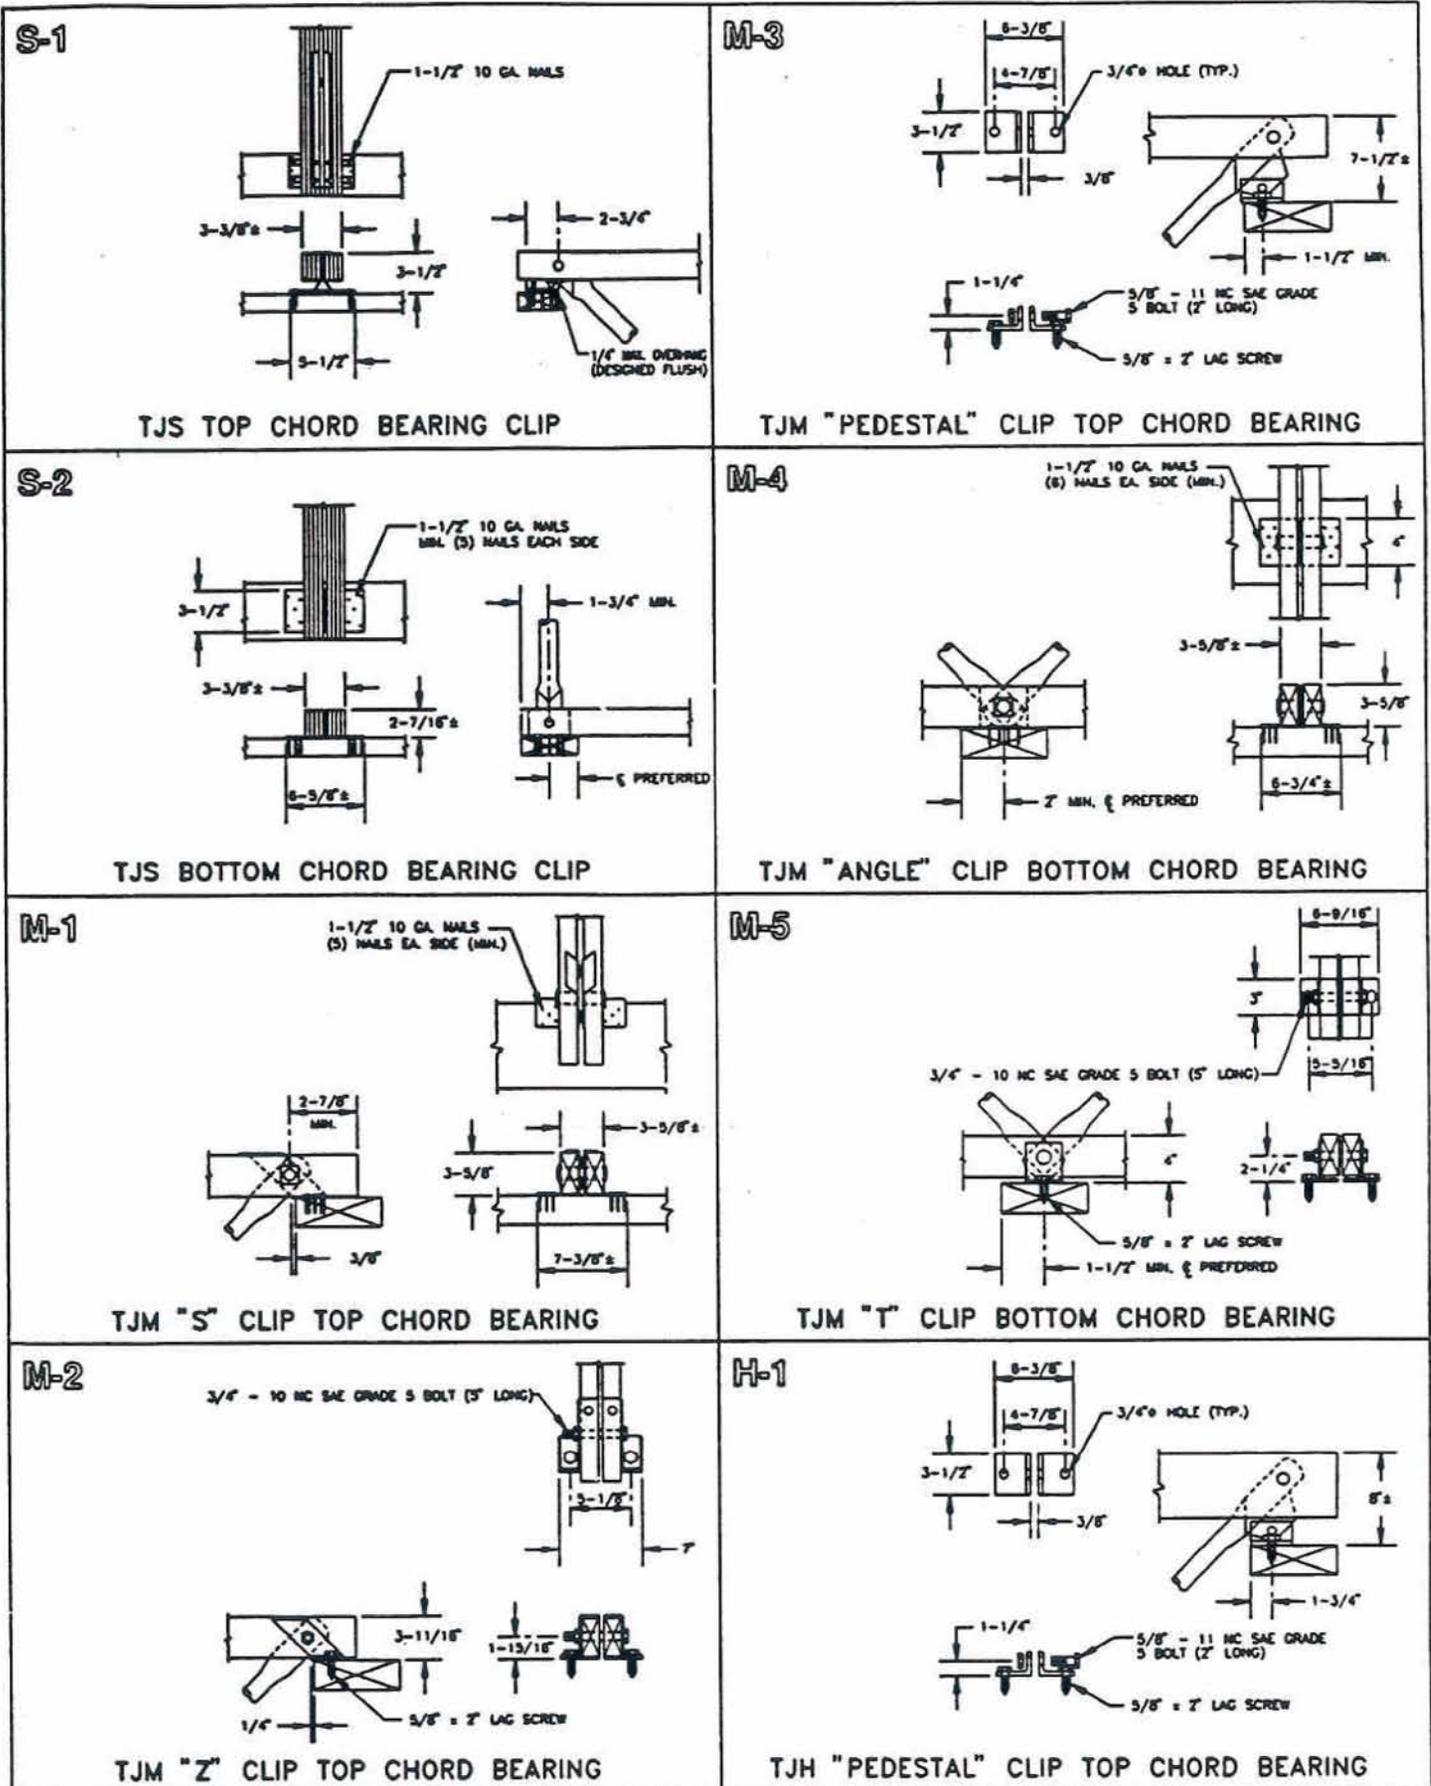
OPEN WEB TRUSS DETAILS—(Continued)
